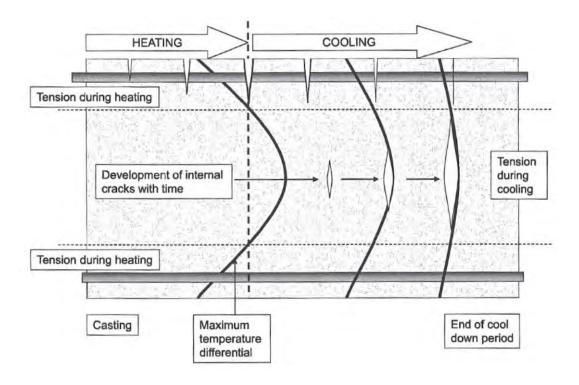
Development of cracks in massive concrete members subject to only internal restraint caused by temperature differences (Bamforth 2007)
